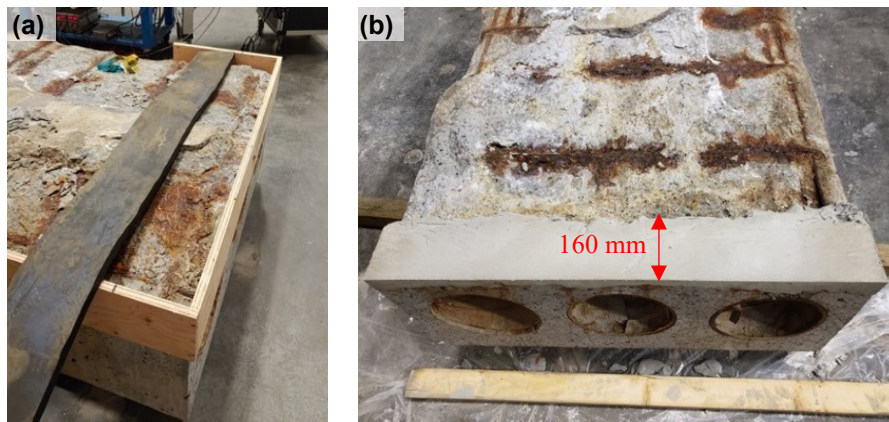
18: Grouting of girder end with damage (a) before grouting (b) after grouting.
